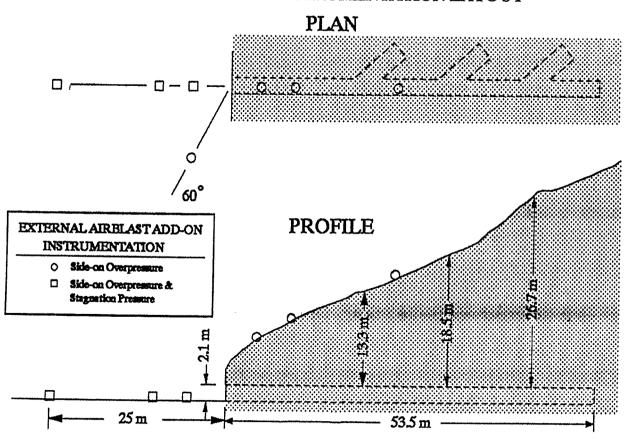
External airblast gage locations, 1/3-Scale Camp Stanley Underground Munitions Storage Concept Validation Test.
